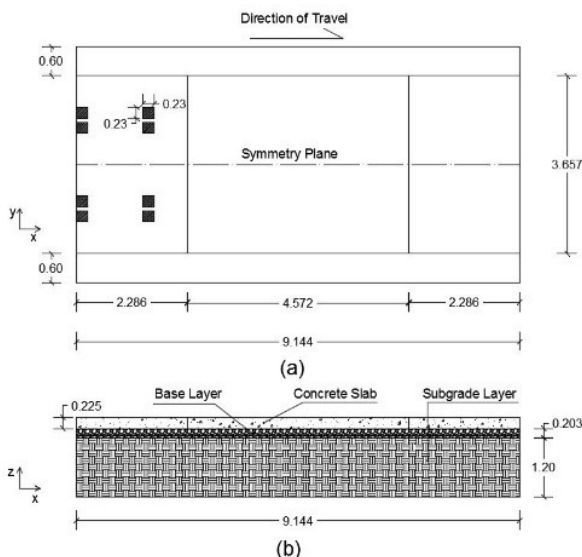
3D finite element model geometry: (a) Plan, (b) Section (Dimensions in meters)
